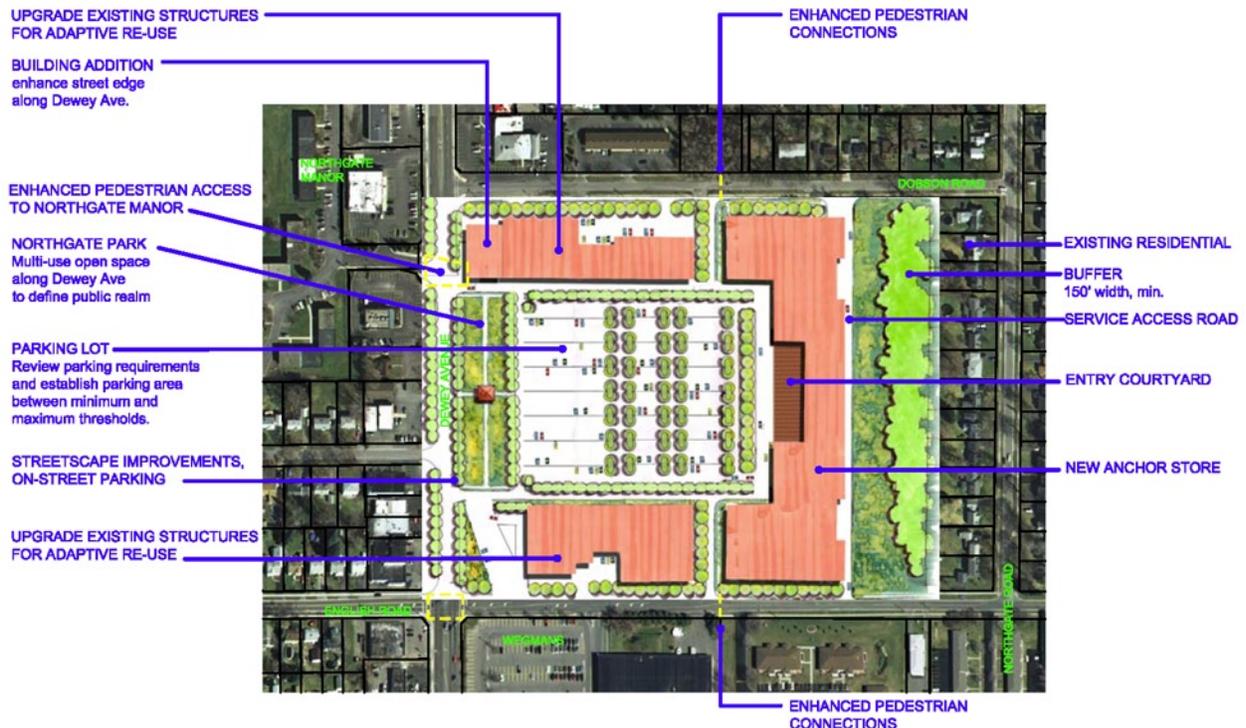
shows smaller buildings along Dewey Ave, with mixed retail frontage on the ground floor and office space above. Accessible from Dewey Avenue, and just to the rear of the small buildings, is a large anchor store. Parking is located inside the parcel, enclosed by smaller mixed use and apartment buildings that front along Dobson and English Roads. Existing residential areas are buffered by green space, and a new road provides connections to the plaza.
